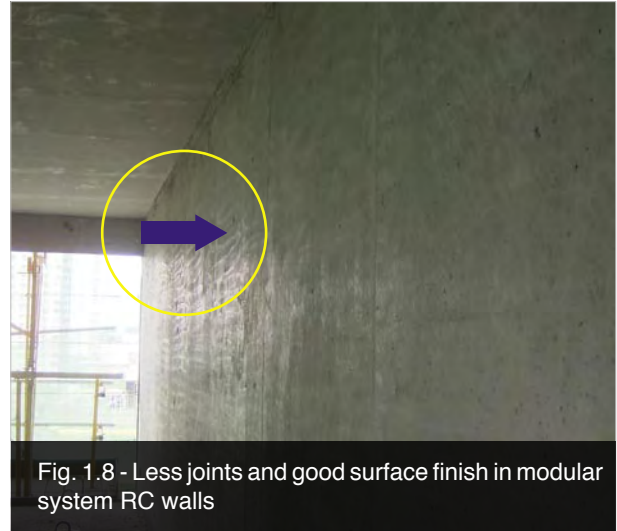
Less joints and good surface finish in modular system RC walls
